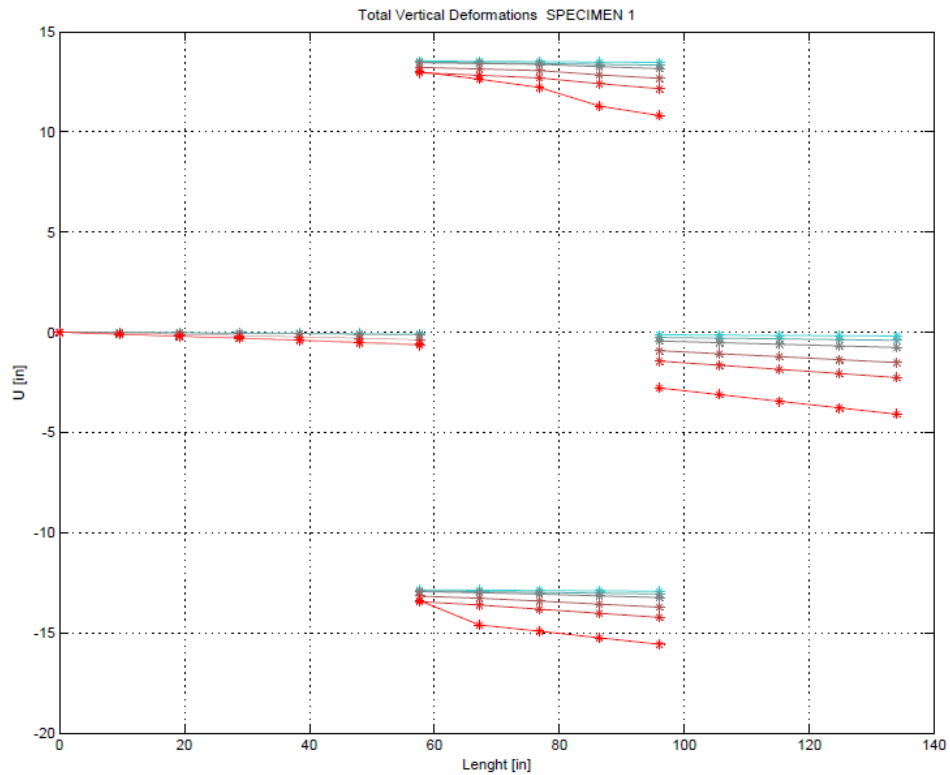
Failure at the opening using alternative beam discretization and lower strengths for the reinforcing steel. Downward push for Specimen 1.
